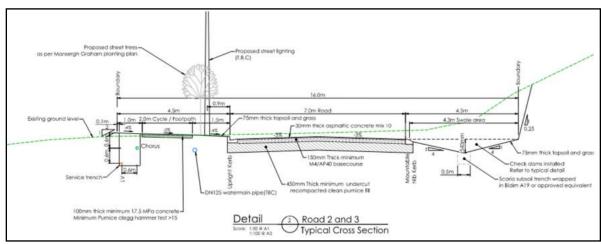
Preliminary Cul-de-Sac Typical Cross Section
